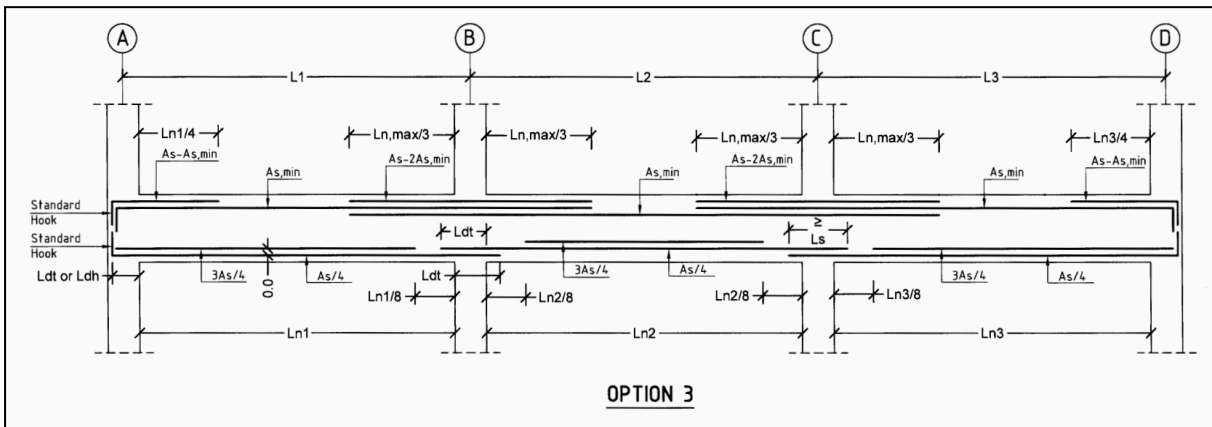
Schematic of ACI 318-19 beam detailing requirements, Option 3
